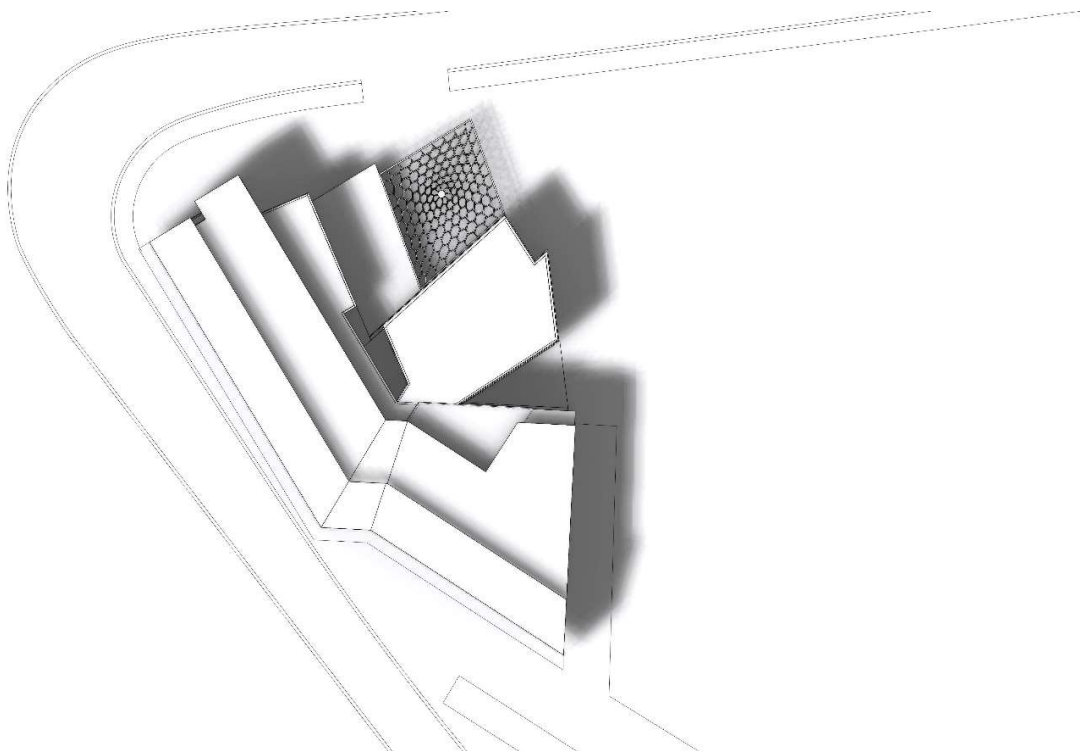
Plan view showing existing building, new building and planned pavilion.
